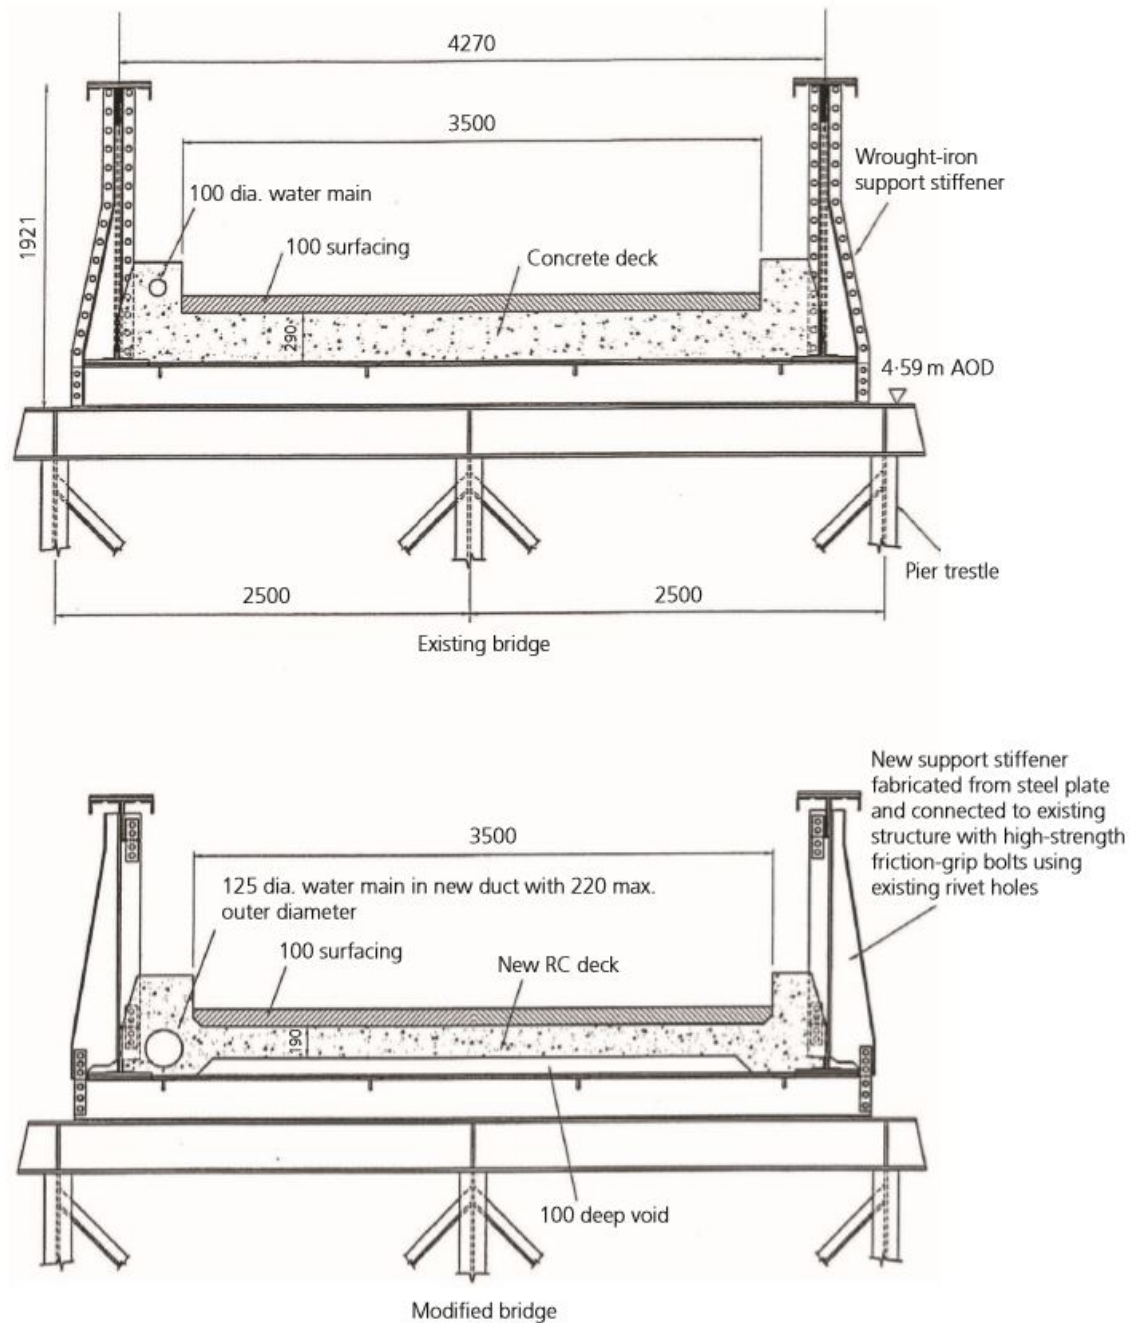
Drawing of previous deck profile and new voided deck slab profile
